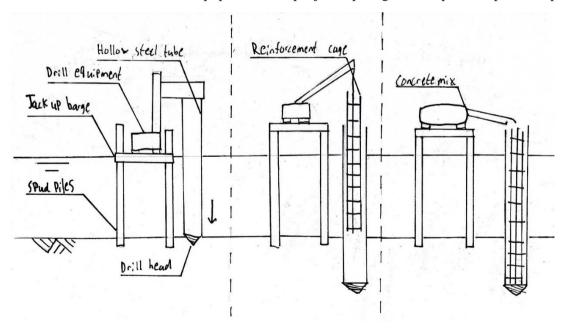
Placement of Fundex piles in the sea bed, with a jack-up barge on spud piles (NTS)
